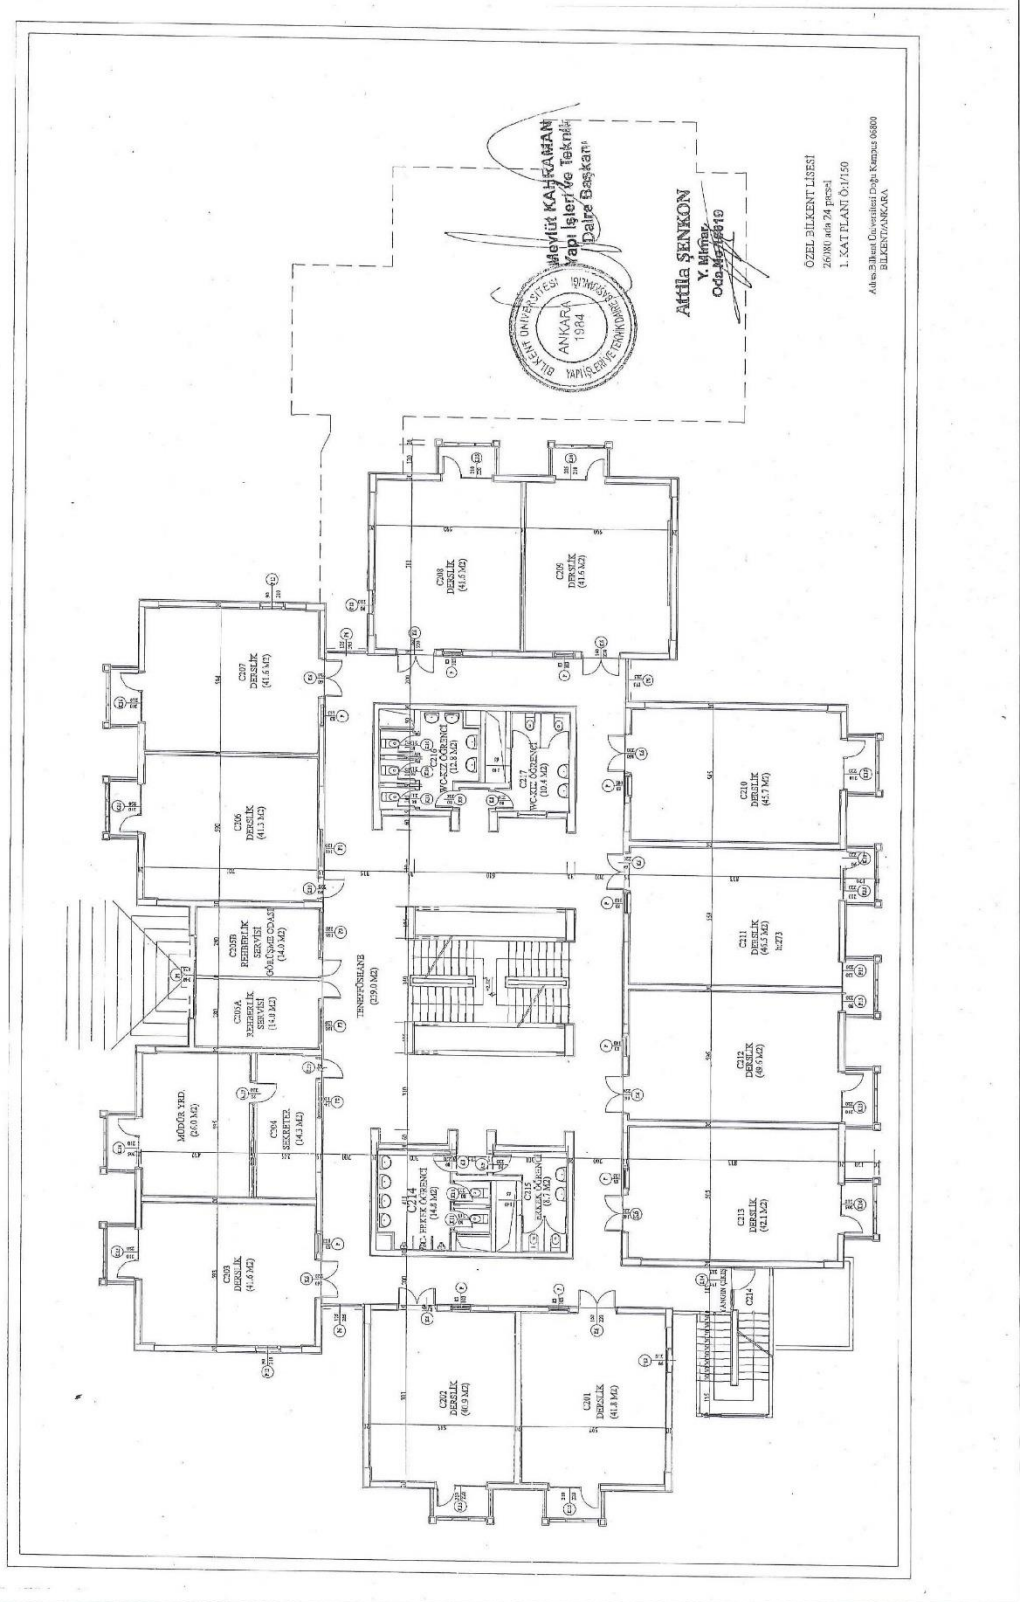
First floor plan of Bilkent High School (not to scale)
